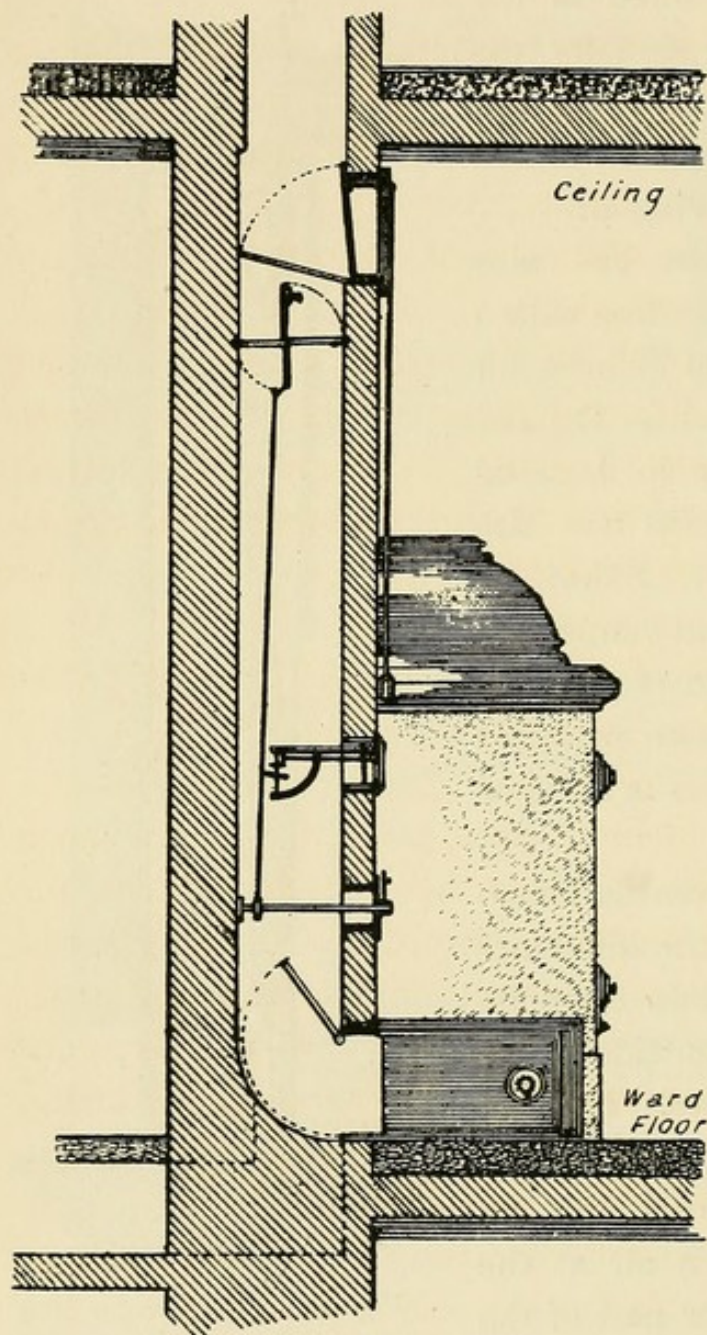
Extraction-flue arranged to extract air either from floor-level or from ceiling-level as desired. Rudolf Stift (Dr. Böhm).
